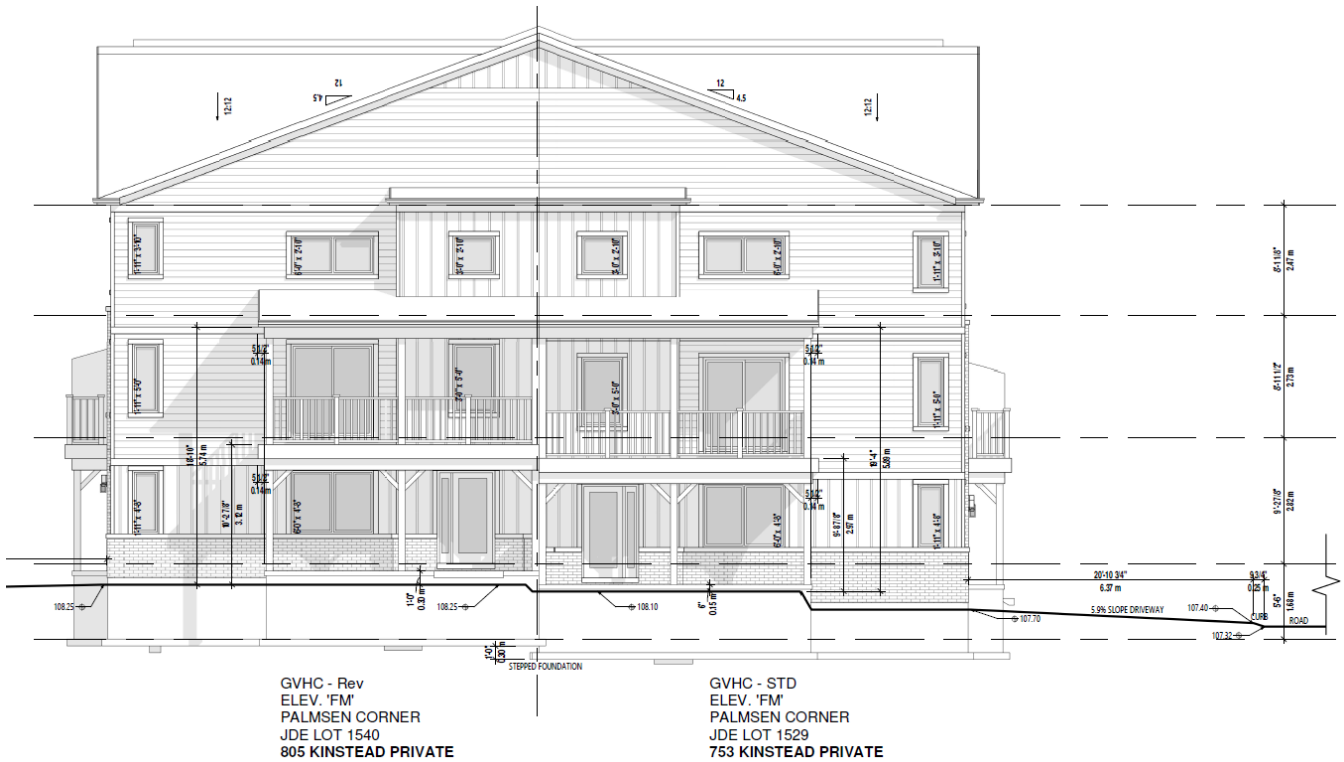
Side Elevation of 753 & 805 Kinstead Private (looking north)
